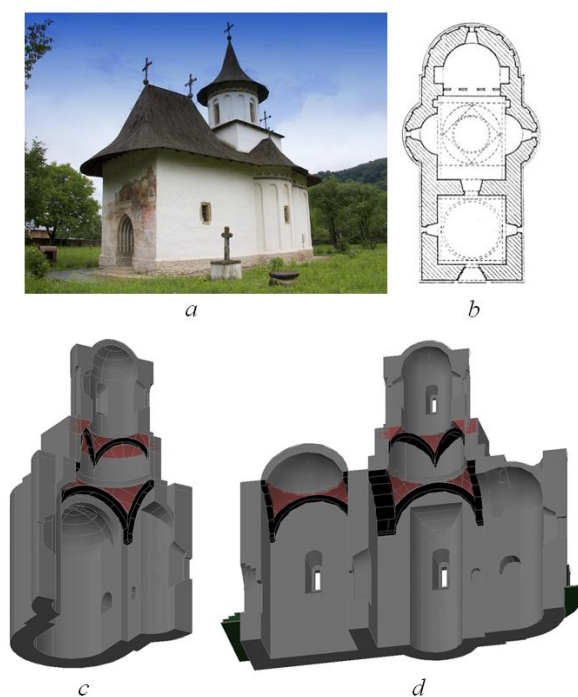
Pătrăuți Church: *a* – main facade; *b* – the plan of the walls; *c* – transversal section; *d* – longitudinal section.
